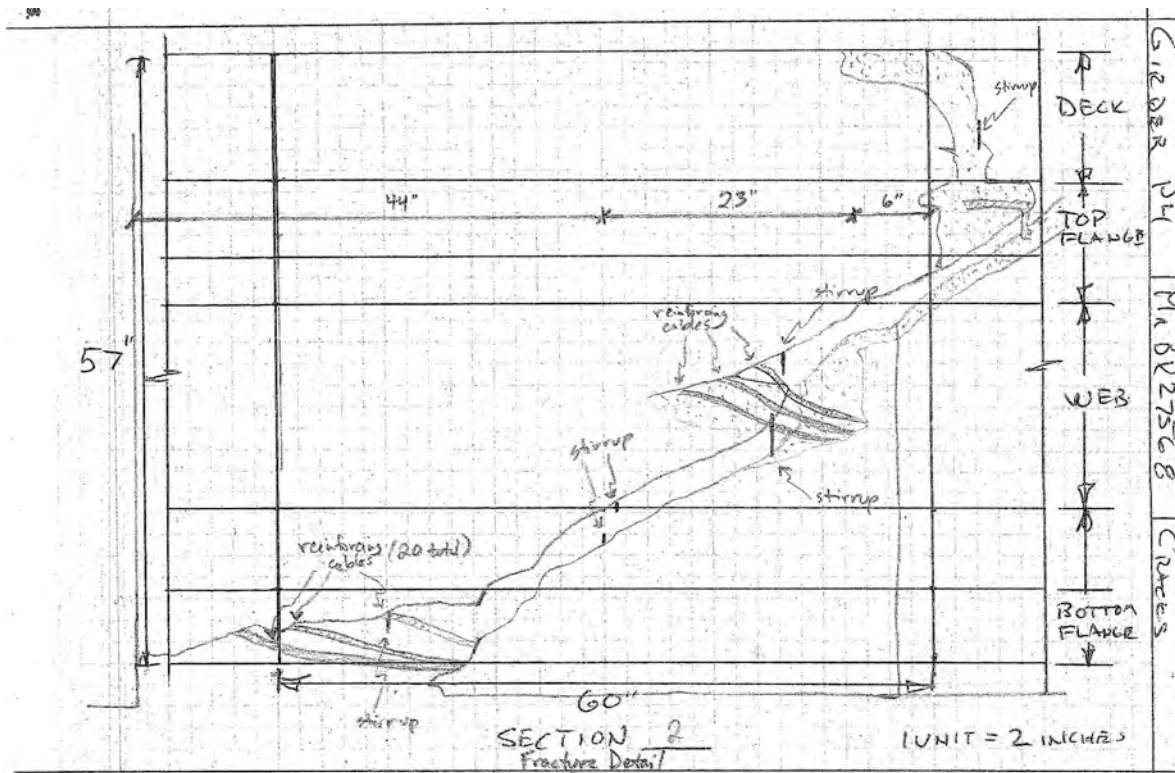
Girder P4 crack pattern – Section 2 (Bar Fracture Detail)
